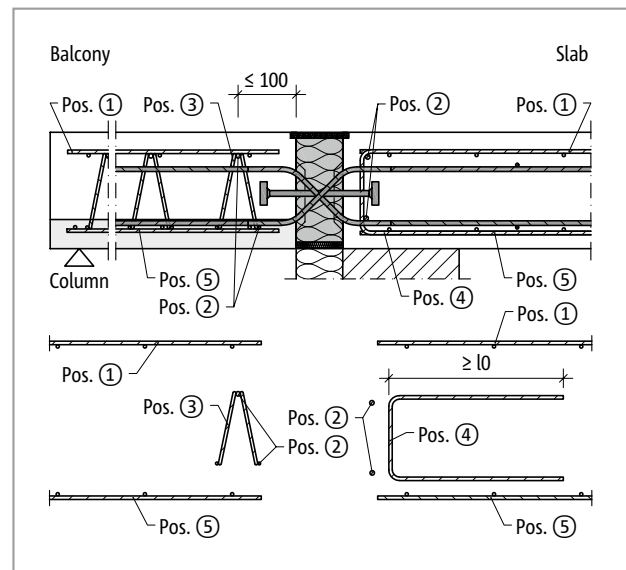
Schöck Isokorb® T type Q-P-VV: On-site reinforcement, balcony side with lattice beam
